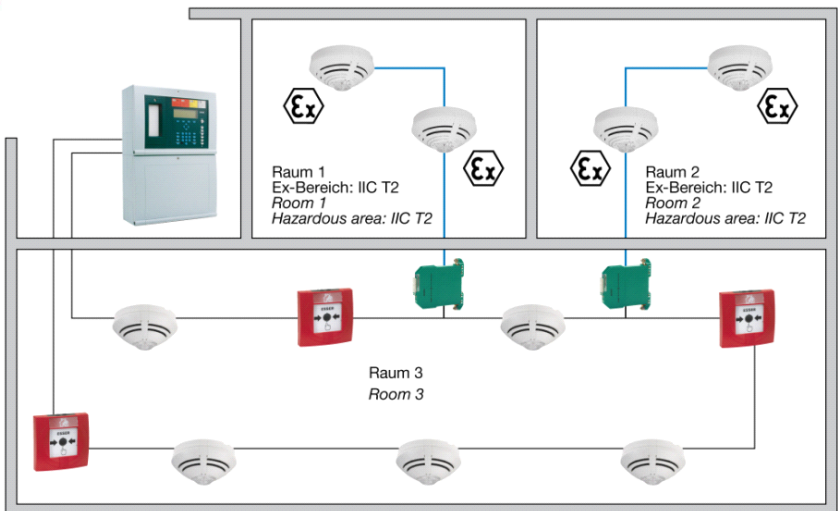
Principal wiring with Ex barrier (Part No. 804744)
